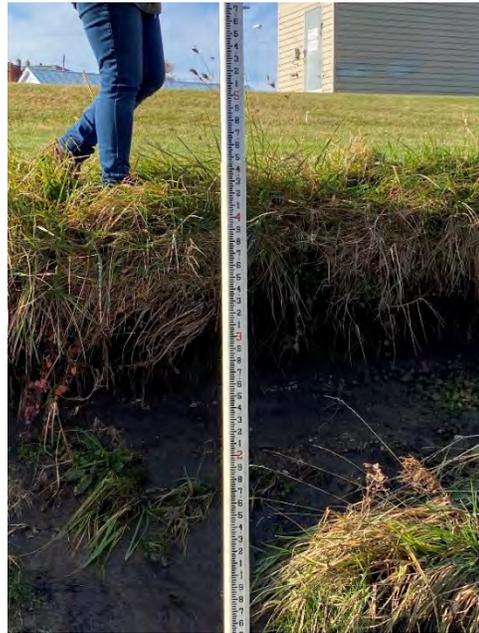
Sta. 35+50-36+00 Severe. Bank exposed, channel cross-section U-shaped, slumps/slips, and vegetative overhang.
